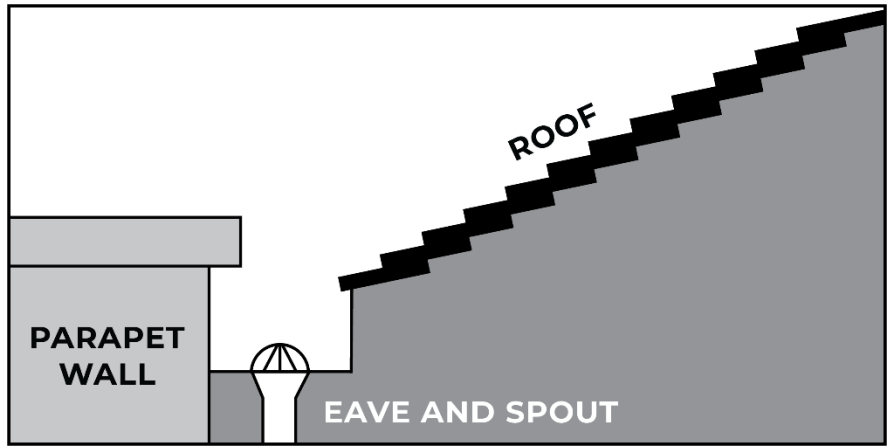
EXAMPLE OF A PARAPET WALL AND EAVES
